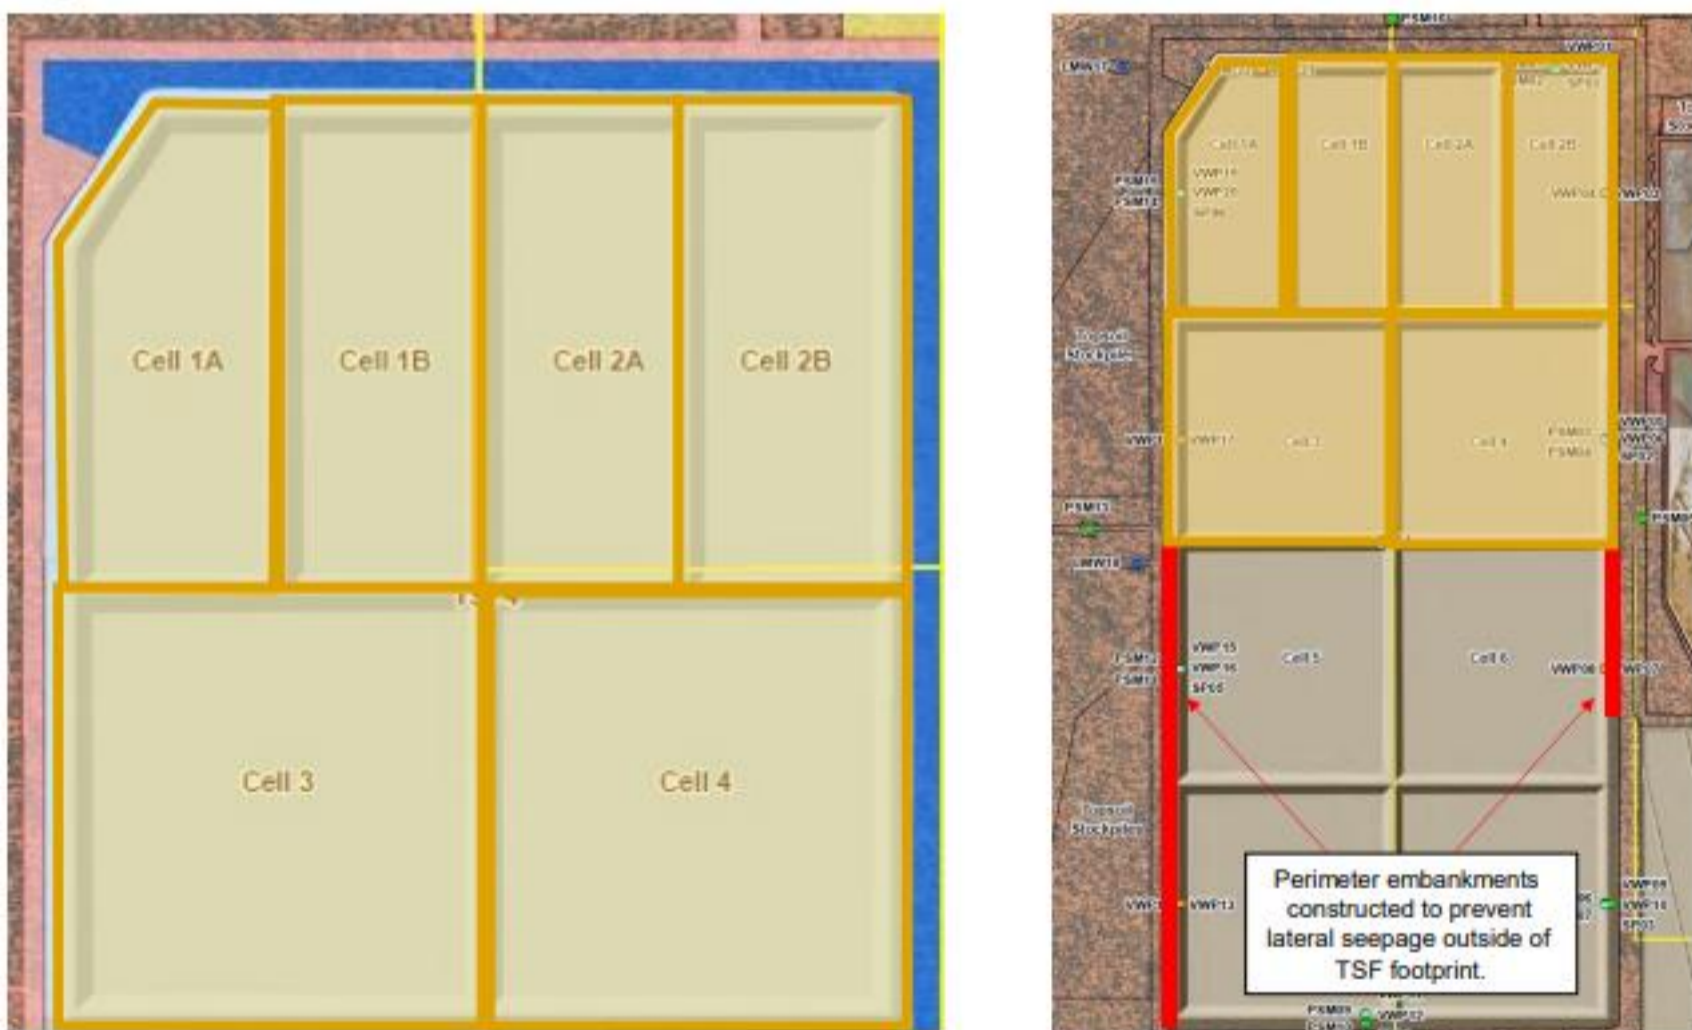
Plan showing Stage 6 of the TSF construction – Cell 3 construction
